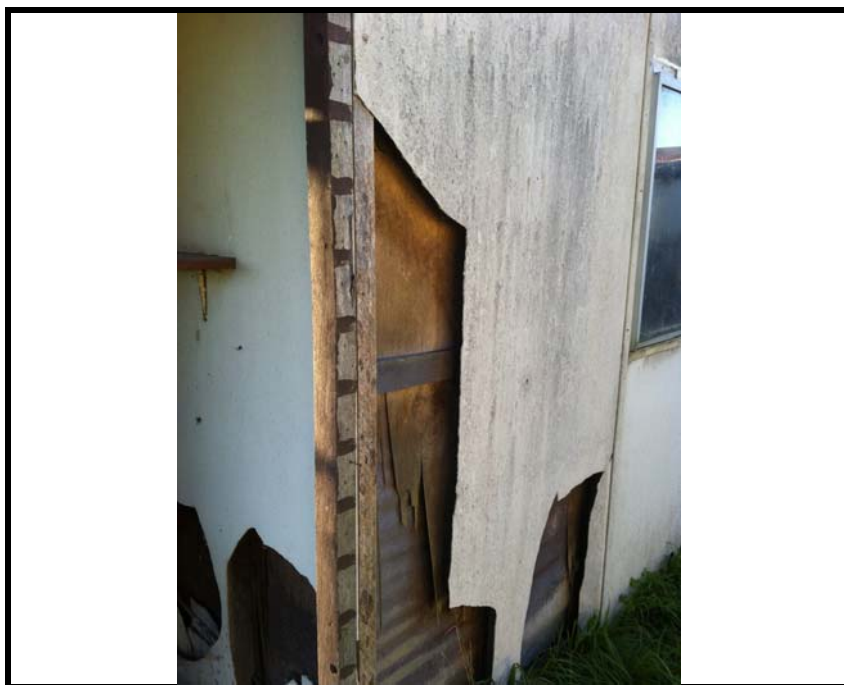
8 Bowditch Avenue - section of the AC sheeting used in the eaves to the house.
